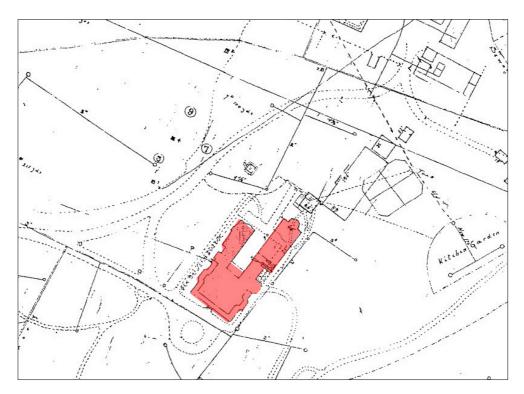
Extract from a c1920 water supply plan for Rupertswood. Source: Reproduced from 'Rupertswood Garden Conservation Plan'.
